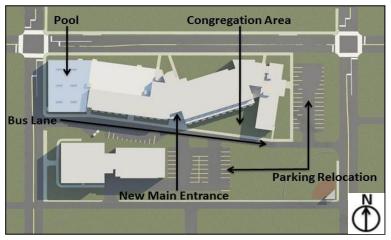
Nexus' Revised Campus Plan (building moved east, parking reallocated, and pool addition)
